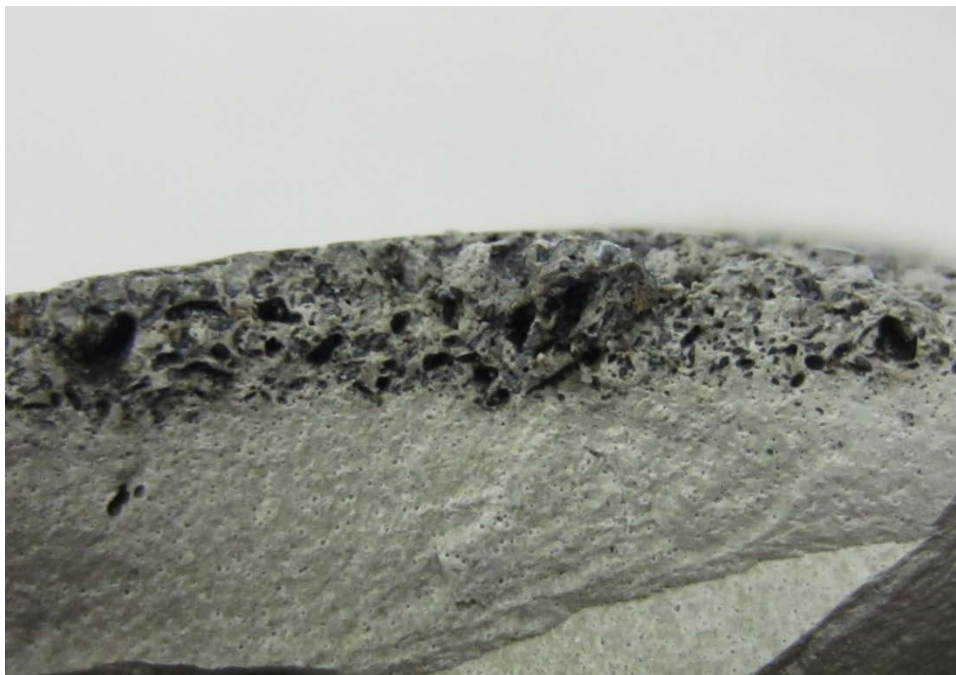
Photo. Cross section of the grout piece shown in figure 222.
